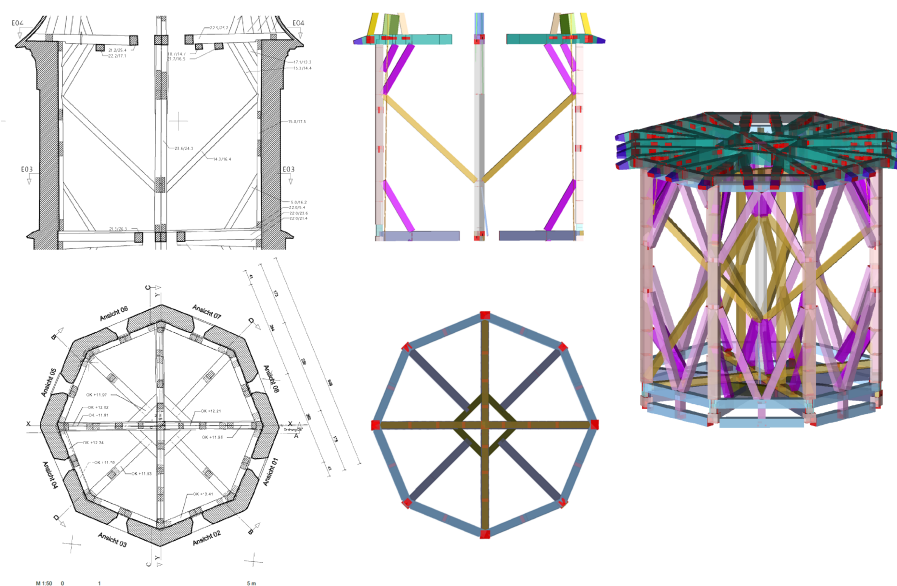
Two-dimensional plan examples and the structural model of the third storey. The first column illustrates the 2D plans of vertical (top) and horizontal (bottom) slices. The second column shows the modeled beams colored by the cross-sections. On the right side, a 3D view of the storey is shown. The source of the 2D plans is “Parish of St. Michael Vienna [52], EKG Baukultur [55]”.
